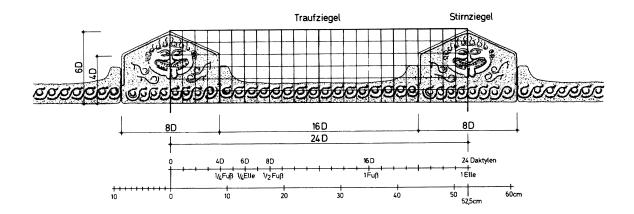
Didyma, Sacred Way, temenos, "Ostbau", tile roof: metrological system of the eaves, detail (P. Schneider)
